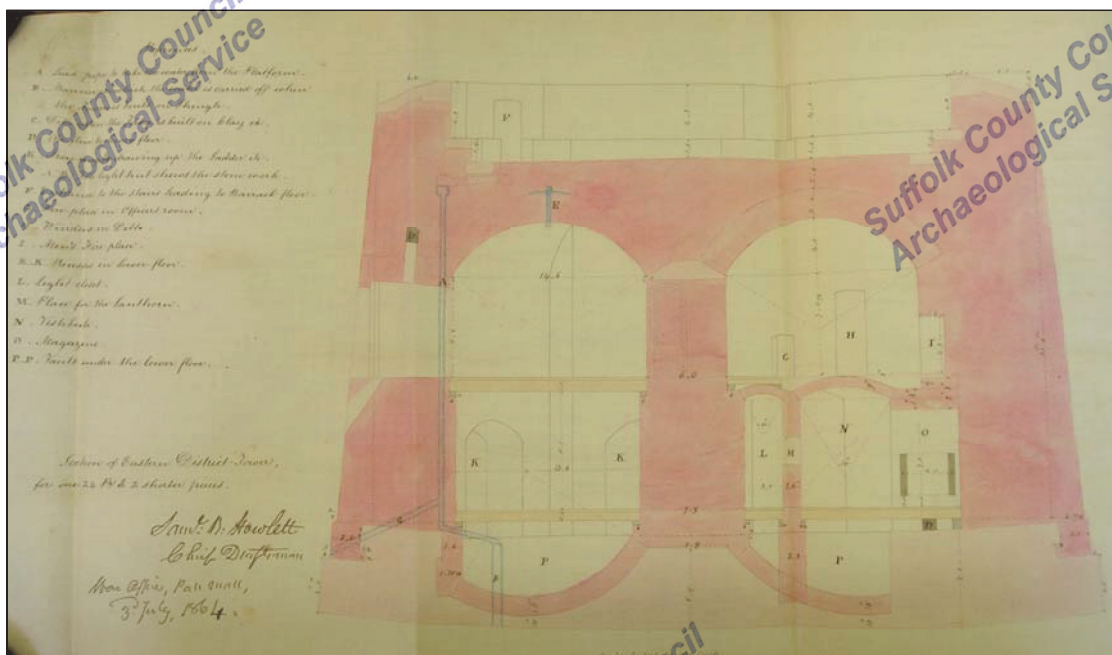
'the general construction of the towers in the Eastern District (except Aldborough tower which is larger than the rest)'
